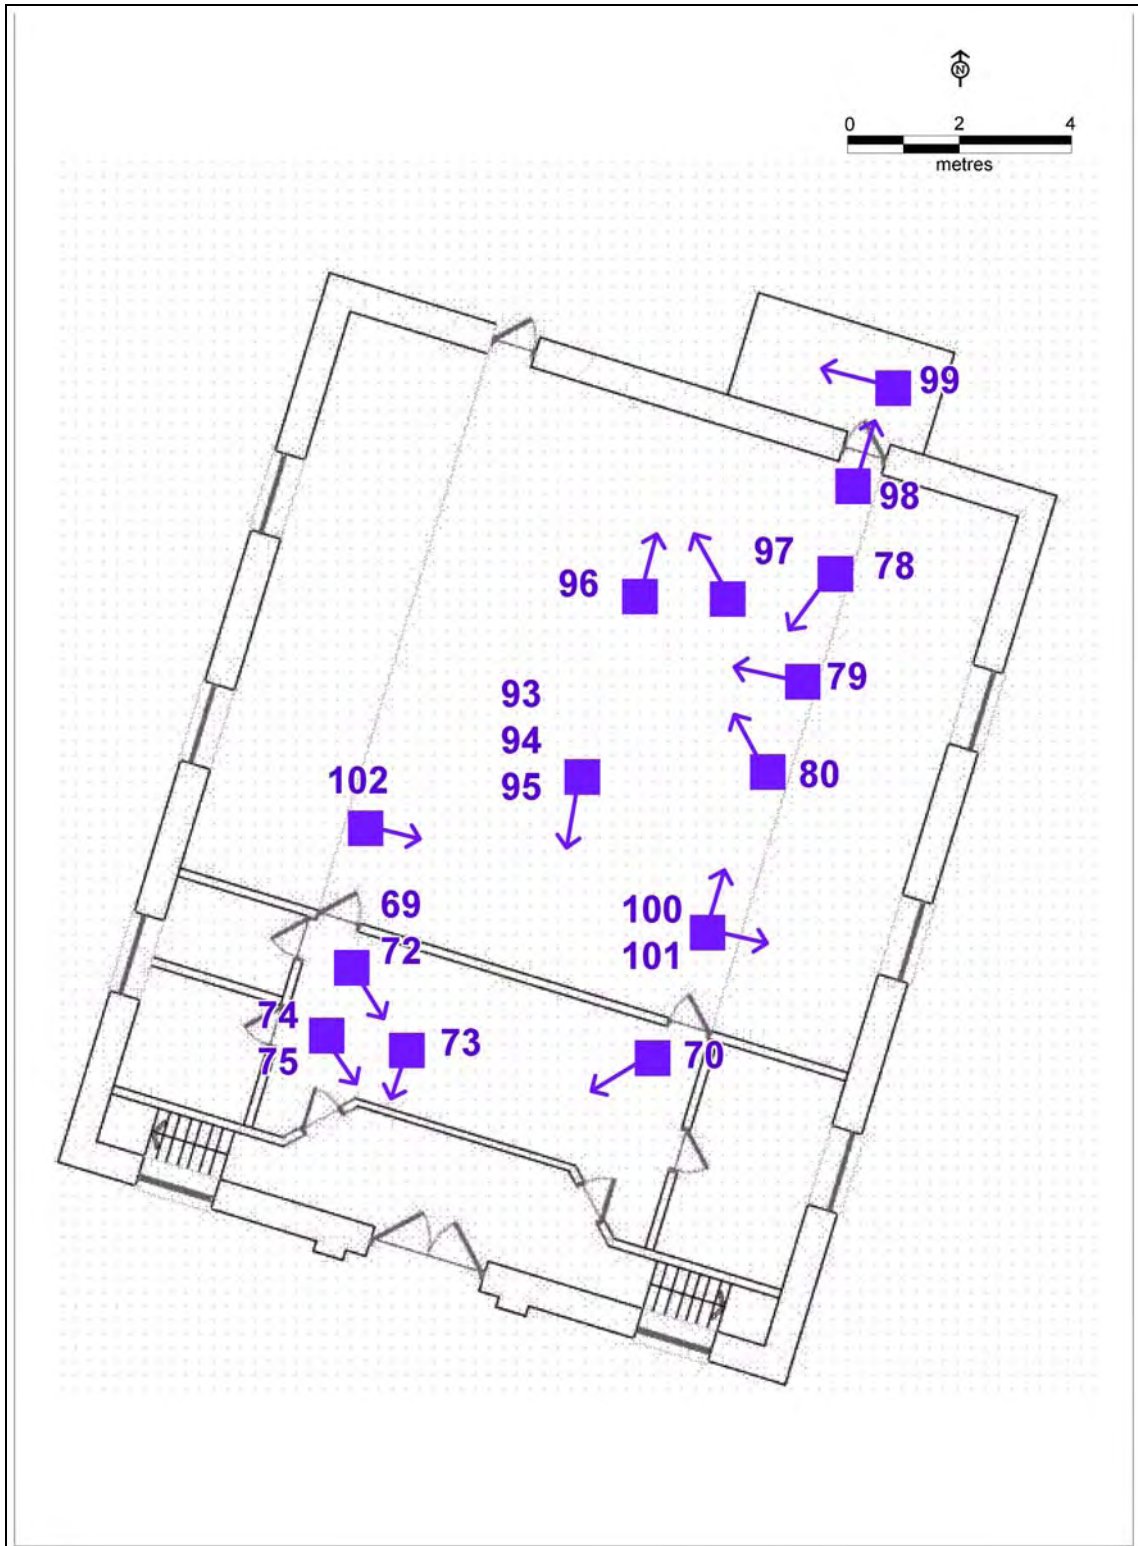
Location of photographs. Internal views of ground floor of chapel, see also Figures 8 and 11.
